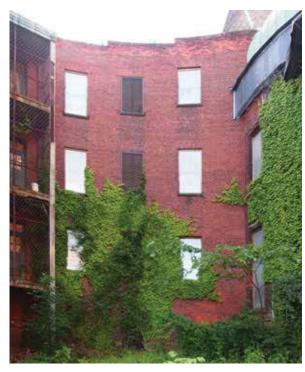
Connector to FDH, West Elevation (CJSA 2019).
